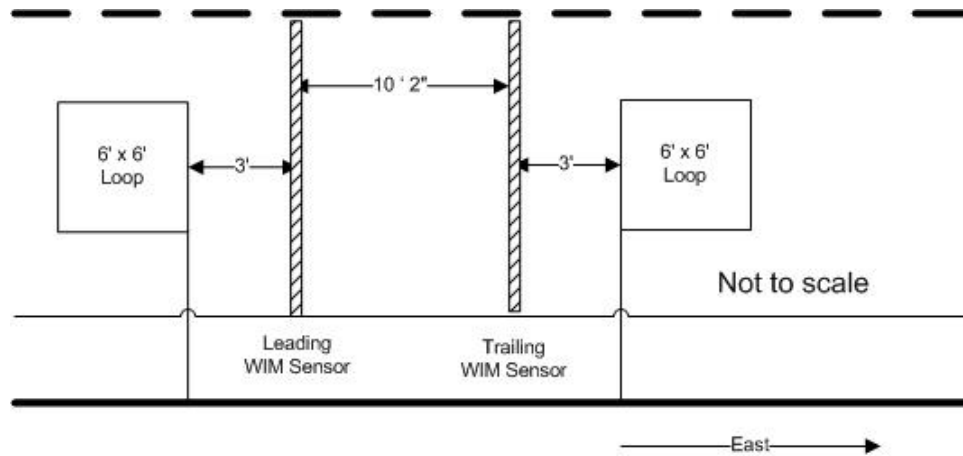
Sketch of Equipment Layout - 350500 - 18-Aug-2008
